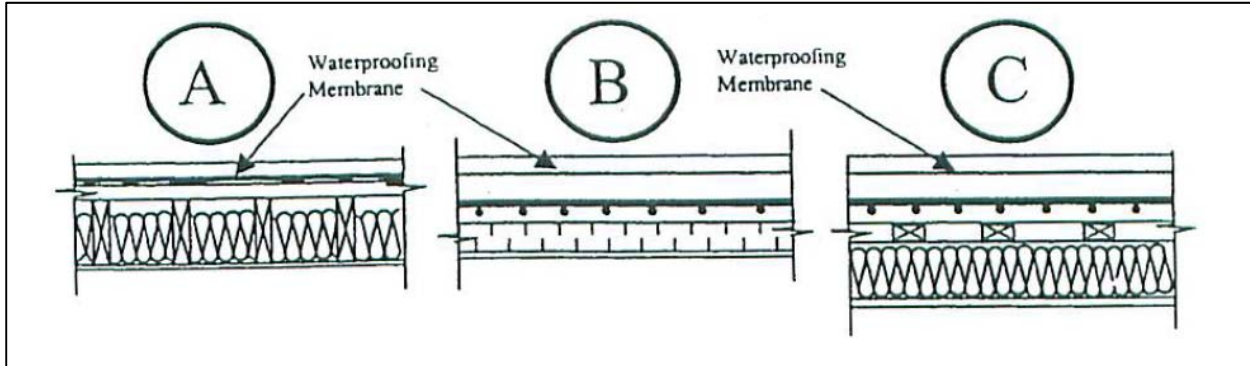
Roof, Deck & Garage Waterproof Membranes above Living Space
